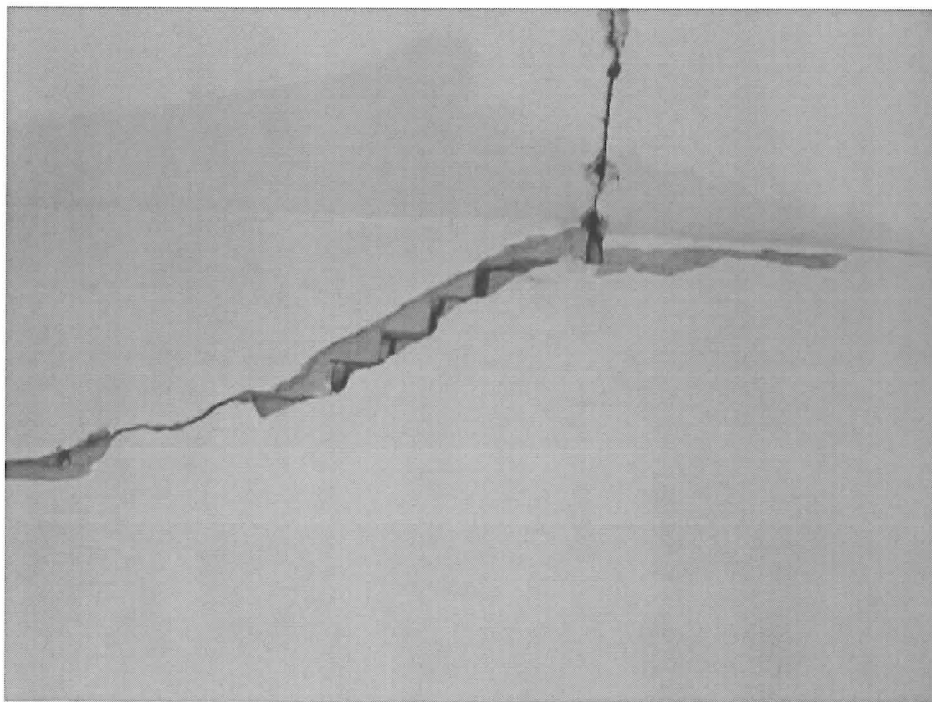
Cracked load-bearing wall and precast slab floor
